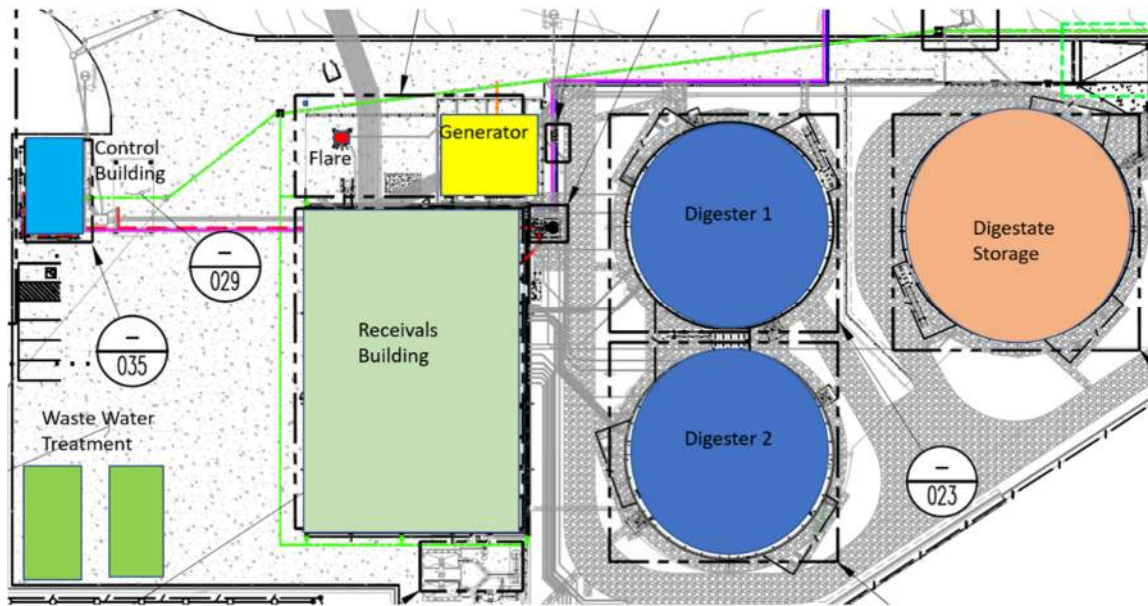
Conceptual Layout – Bio-generation Facility⁴
